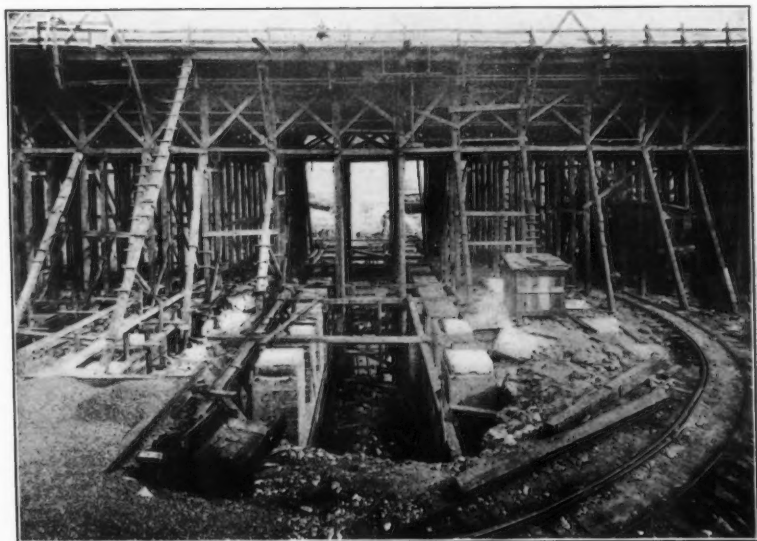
TEMPORARY BRIDGE, PERMANENT FOUNDATIONS, AND TRUCKING SUBWAY,
